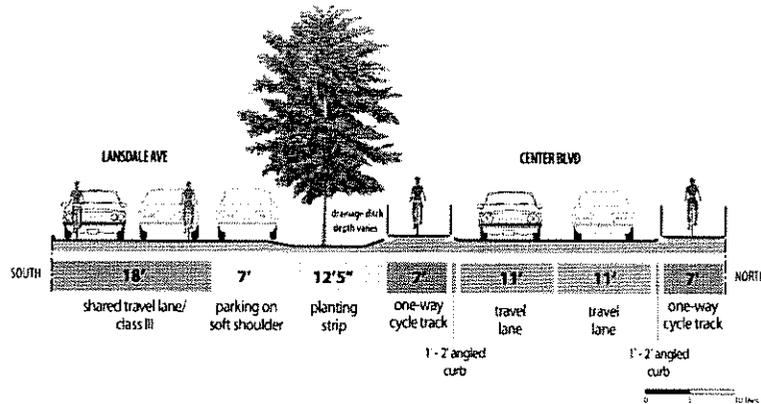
Section of Proposed Improvements for Project 8: Center Boulevard (Forrest Avenue – Madrone Avenue) (Medium-Term Improvements)
